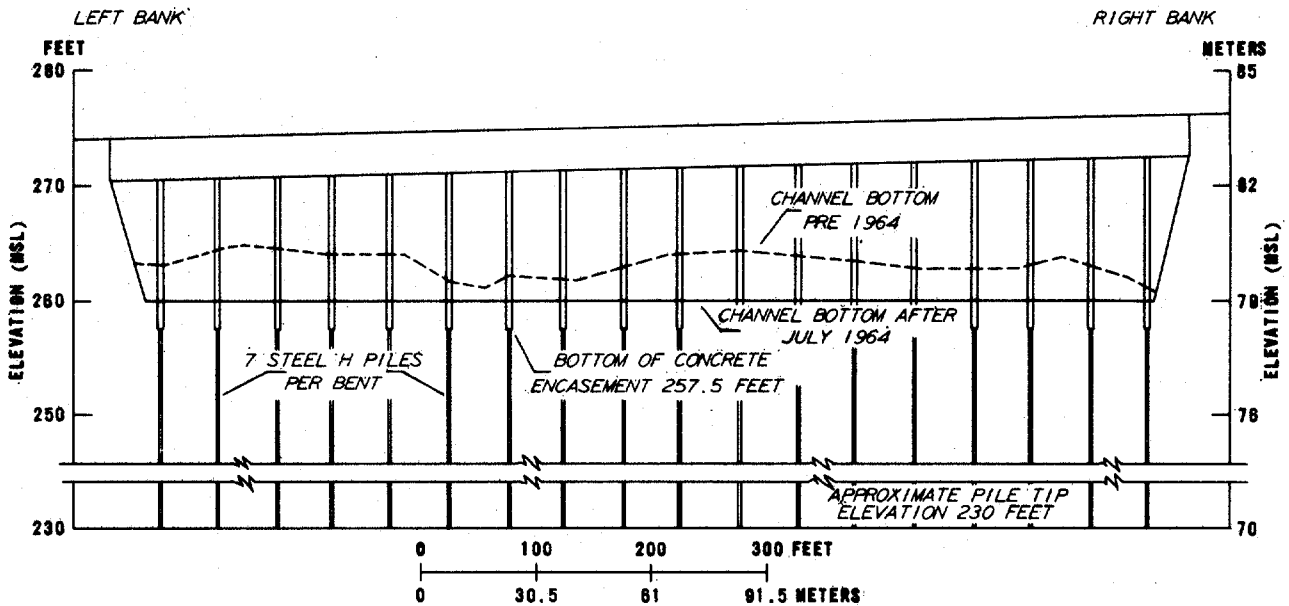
Cross sections of Stony Creek before and after bridge construction in 1964.
